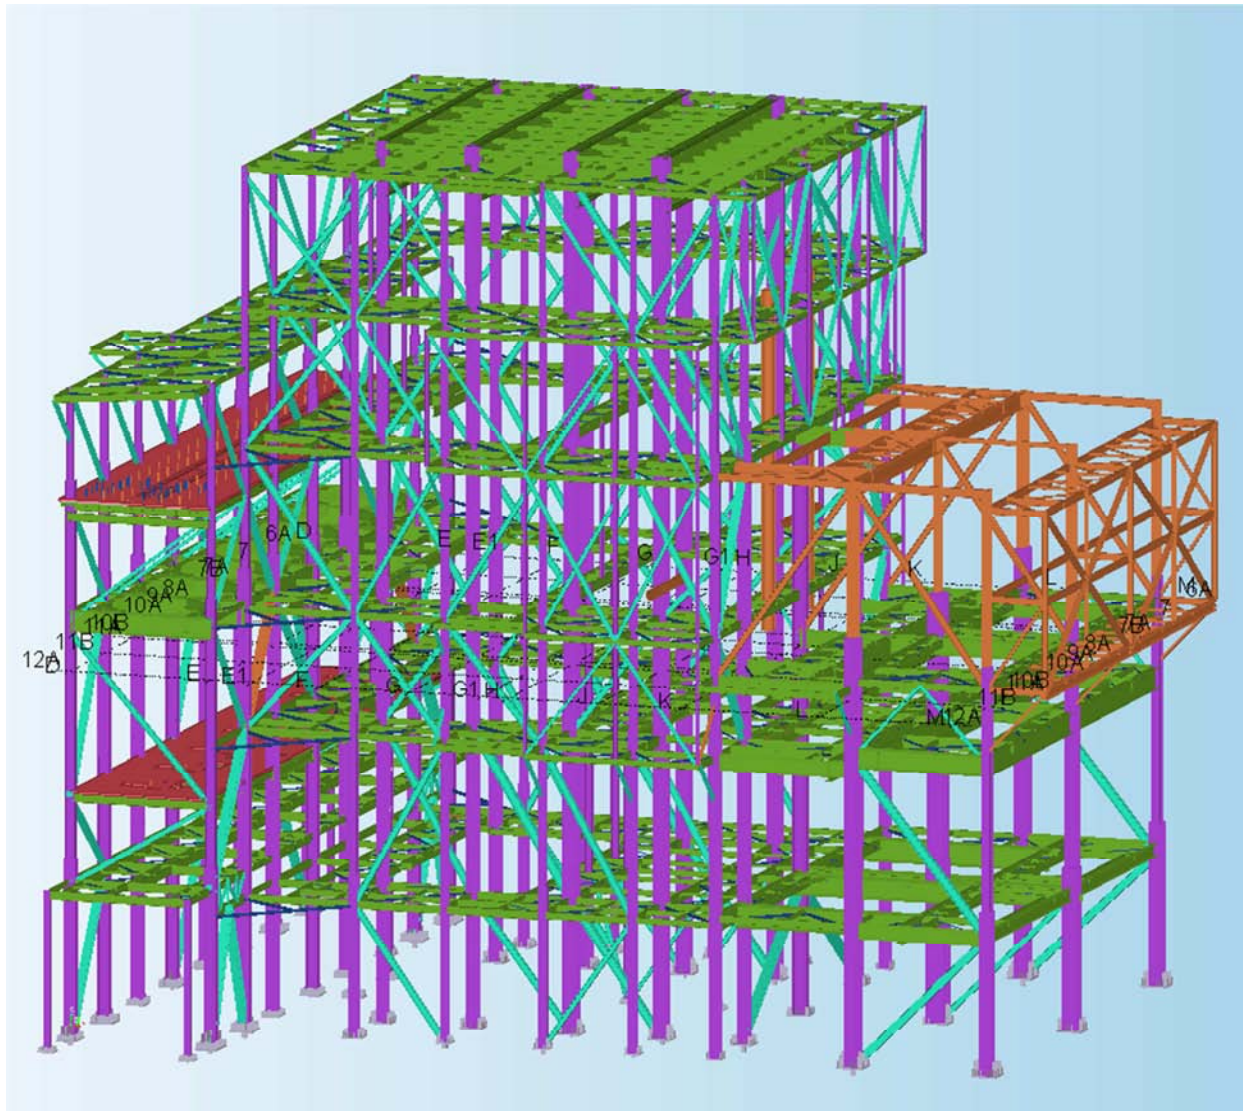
Typical 3D Framing of Boiler Steel Structure.
